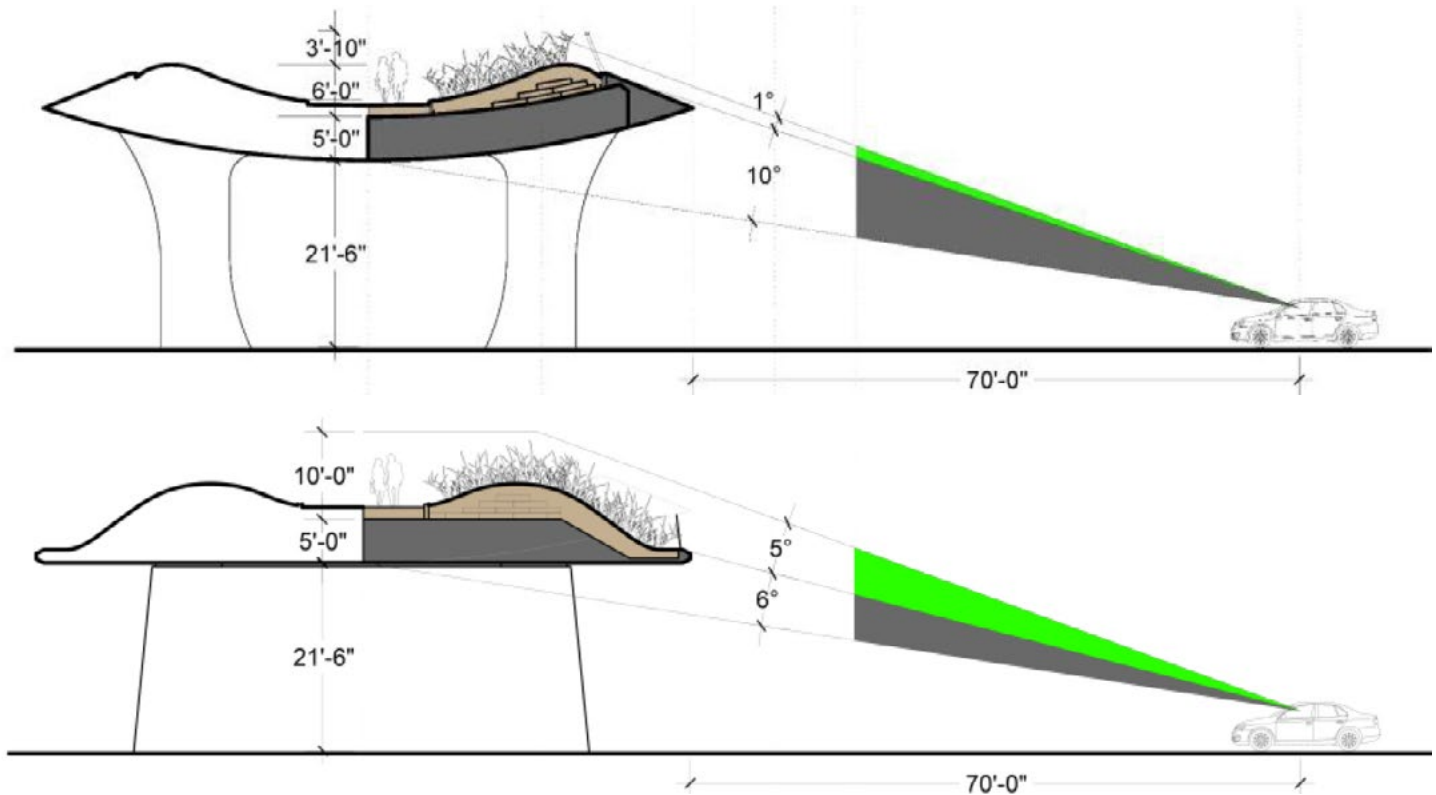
Previous landbridge design (top) and updated landbridge design (bottom)
